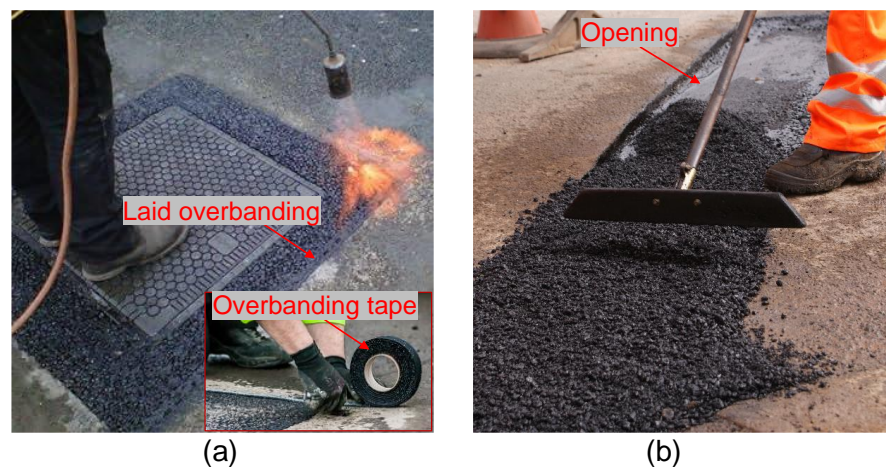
Reinstating openings in flexible pavements, (a) ironworks with overbanding, and (b) utility opening¹⁴.
